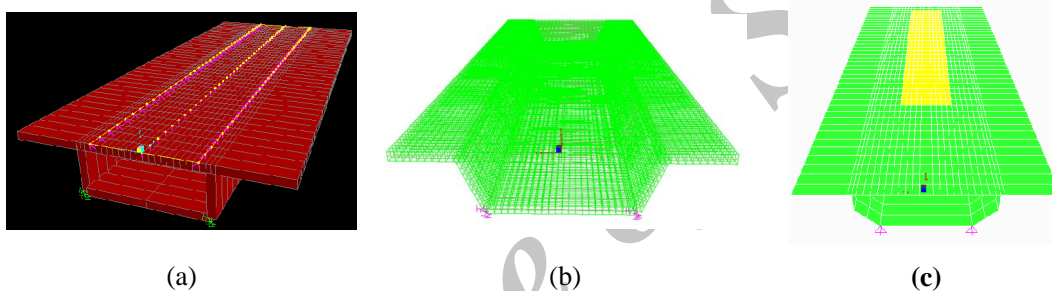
(a) Rectangular, (b) Trapezoidal and (c) Circular cross-section bridge model in SAP
